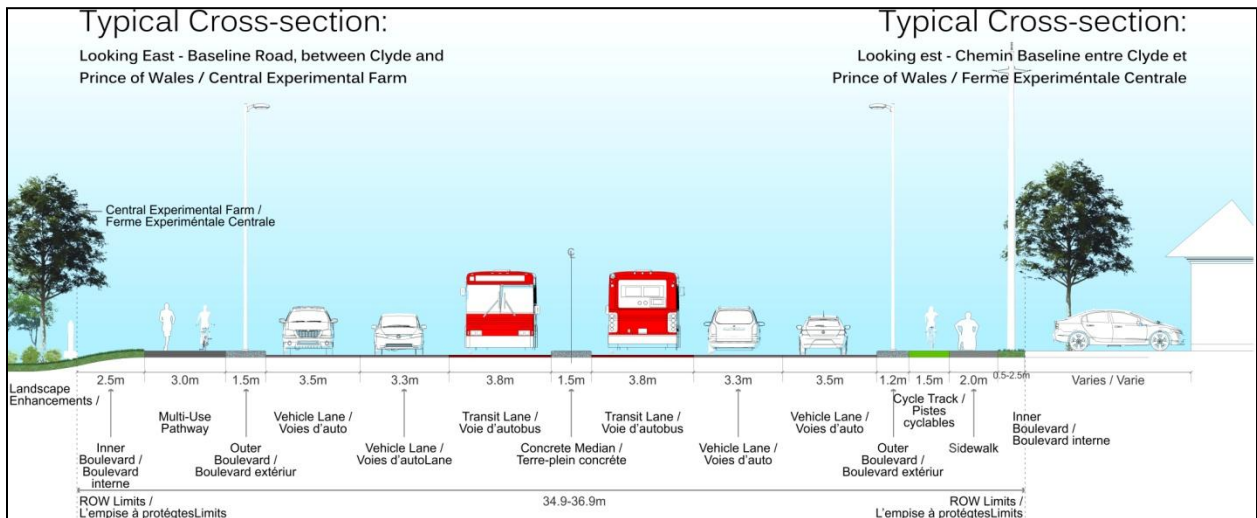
Typical cross-section - Baseline Road (Merivale to Prince of Wales)
